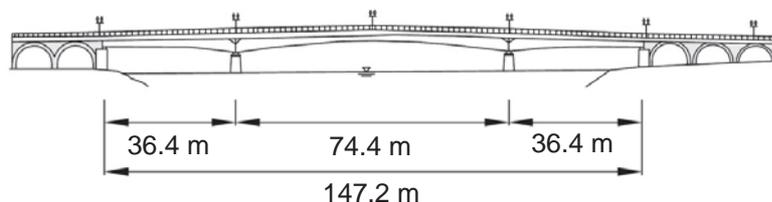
Elevation and longitudinal section of the Mosel river bridge Bernkastel-Kues, Germany, 1995.
